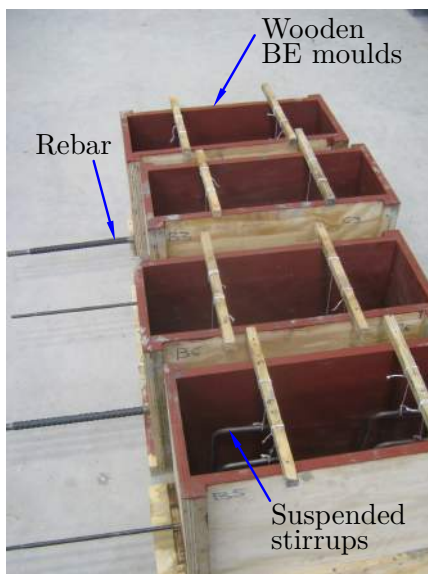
Wooden beam-end moulds with fixed rebar, suspended from temporary wooden cross-bars.
